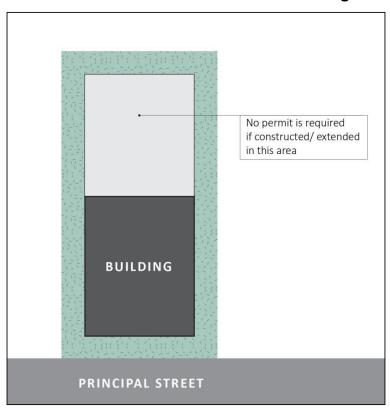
Construction of a single-storey addition or extension to an existing building is exempt if located in this area
